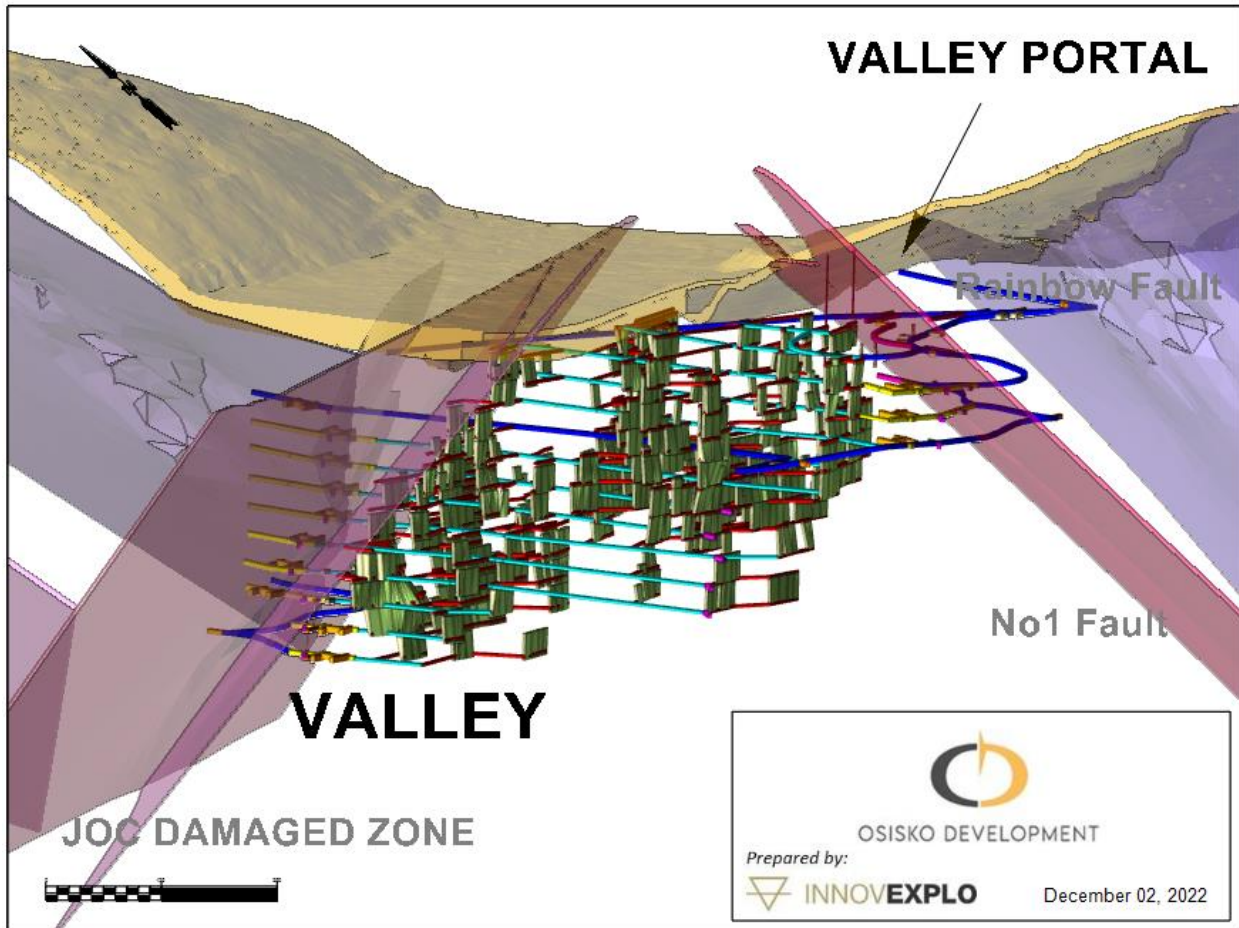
View of Valley Zone showing traversing fault structures, looking north
